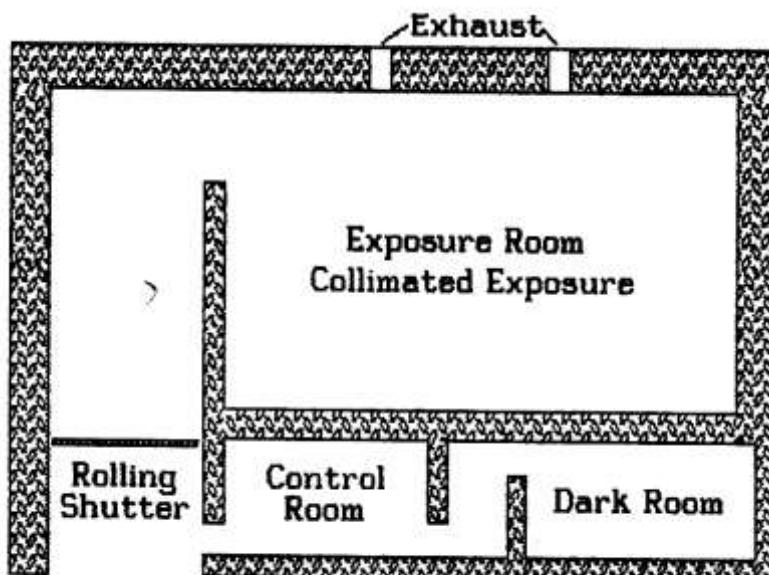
Enclosed Installation (Exposure Room with Maze Entry System)
